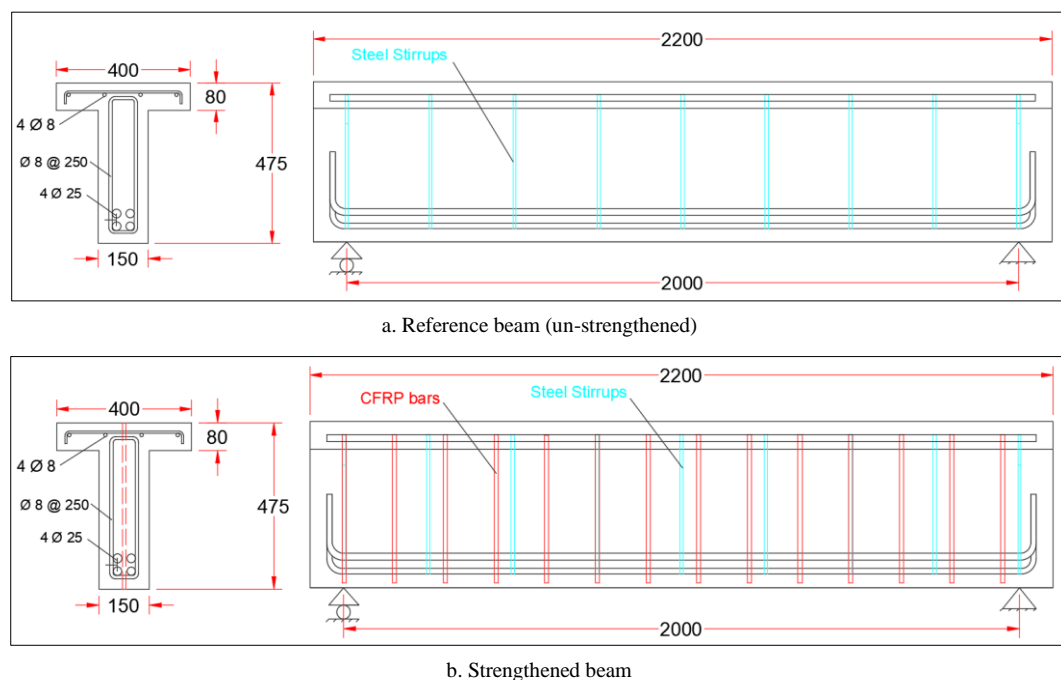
Details of the beams for group one (with stirrups) (all dimensions are in mm)
